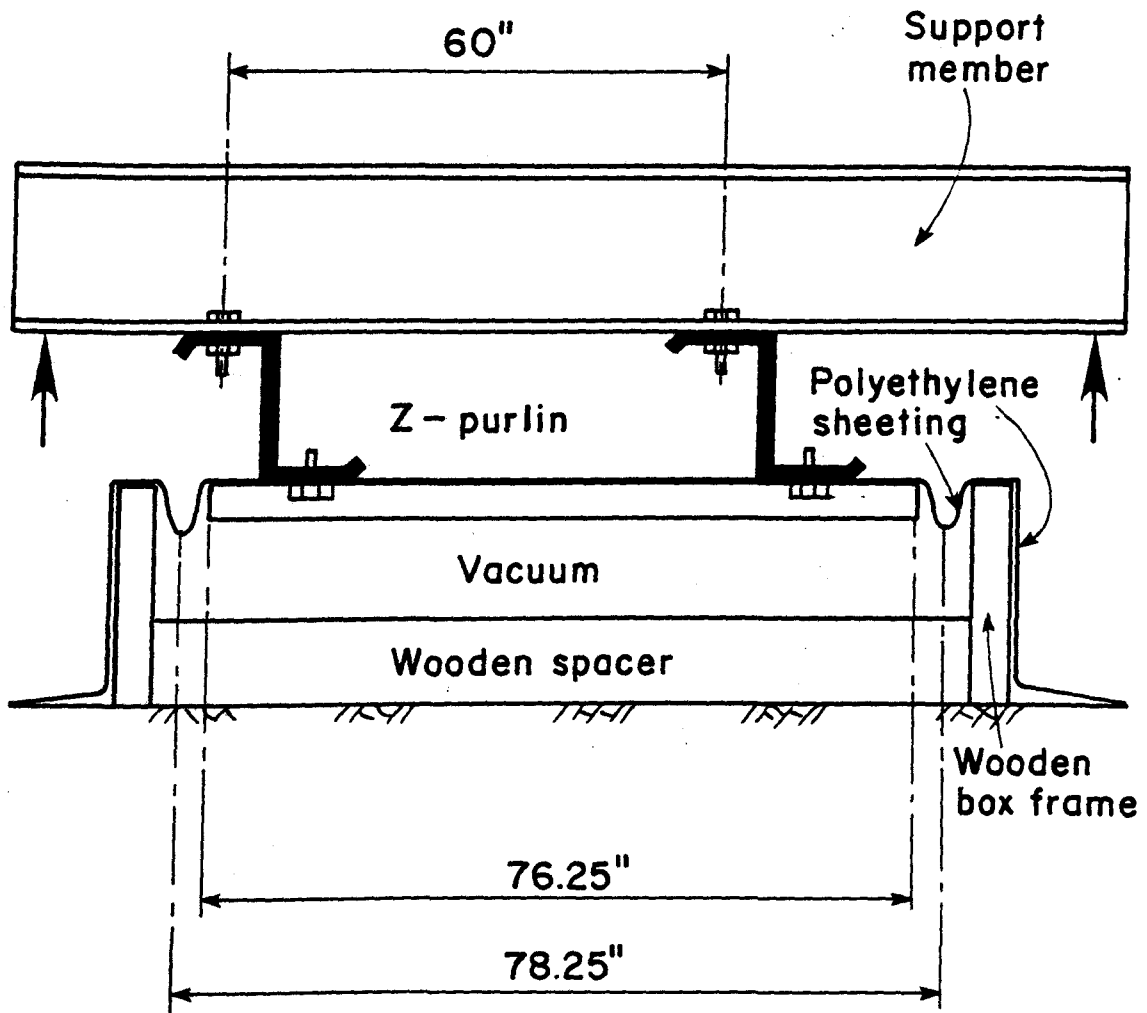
SECTION OF VACUUM TEST SETUP
